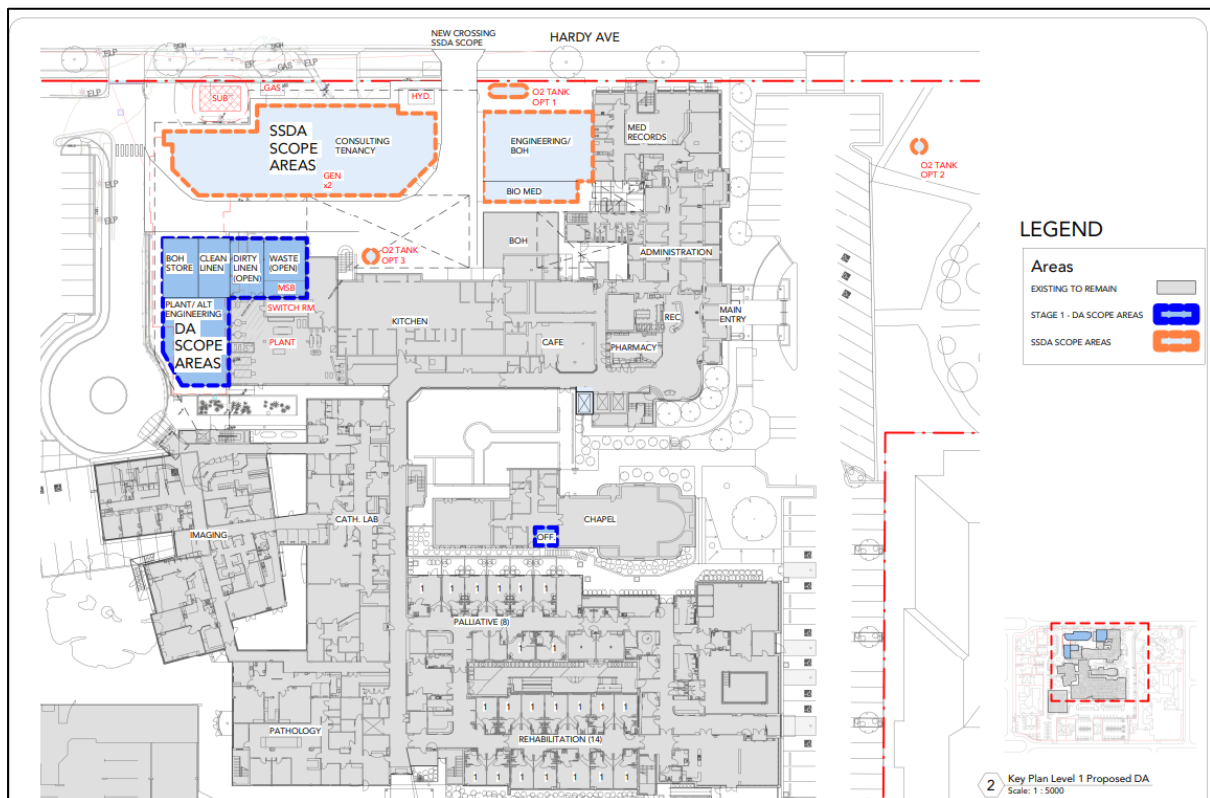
Calvary Riverina Master Plan Level 1 (Source: Team2 Architects, 2026)
